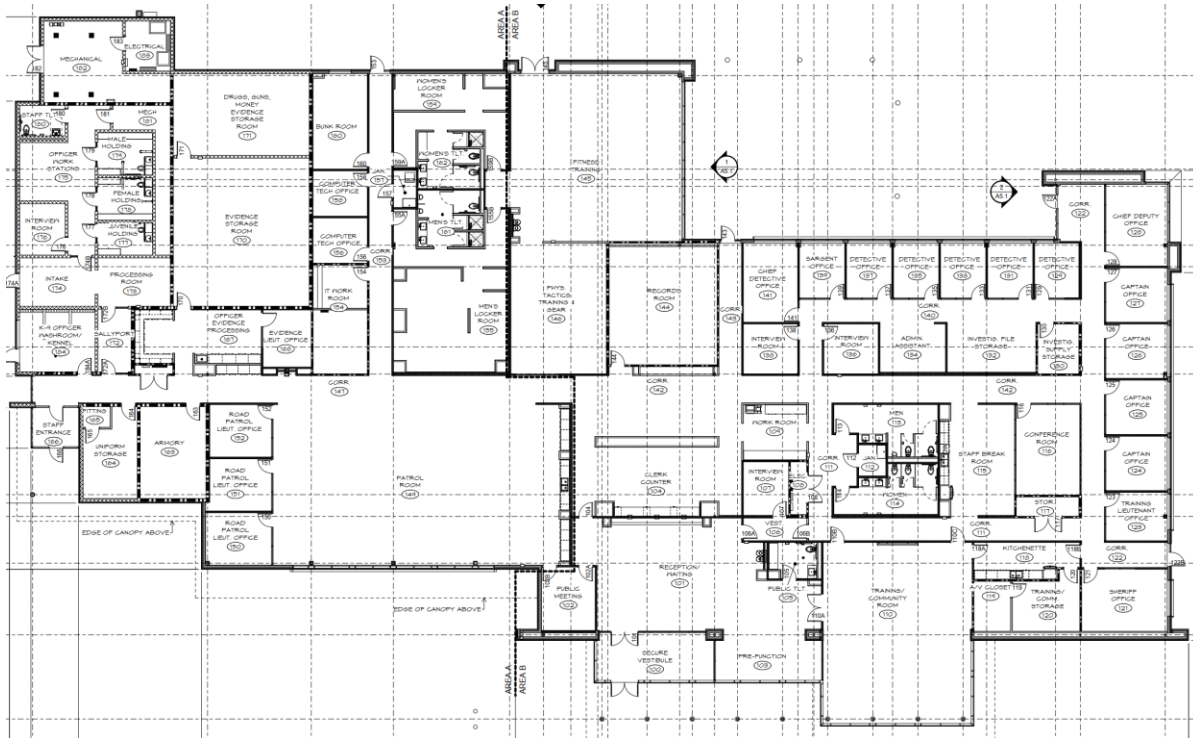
Architectural Floor Plan used in to Trace in the Energy Model
